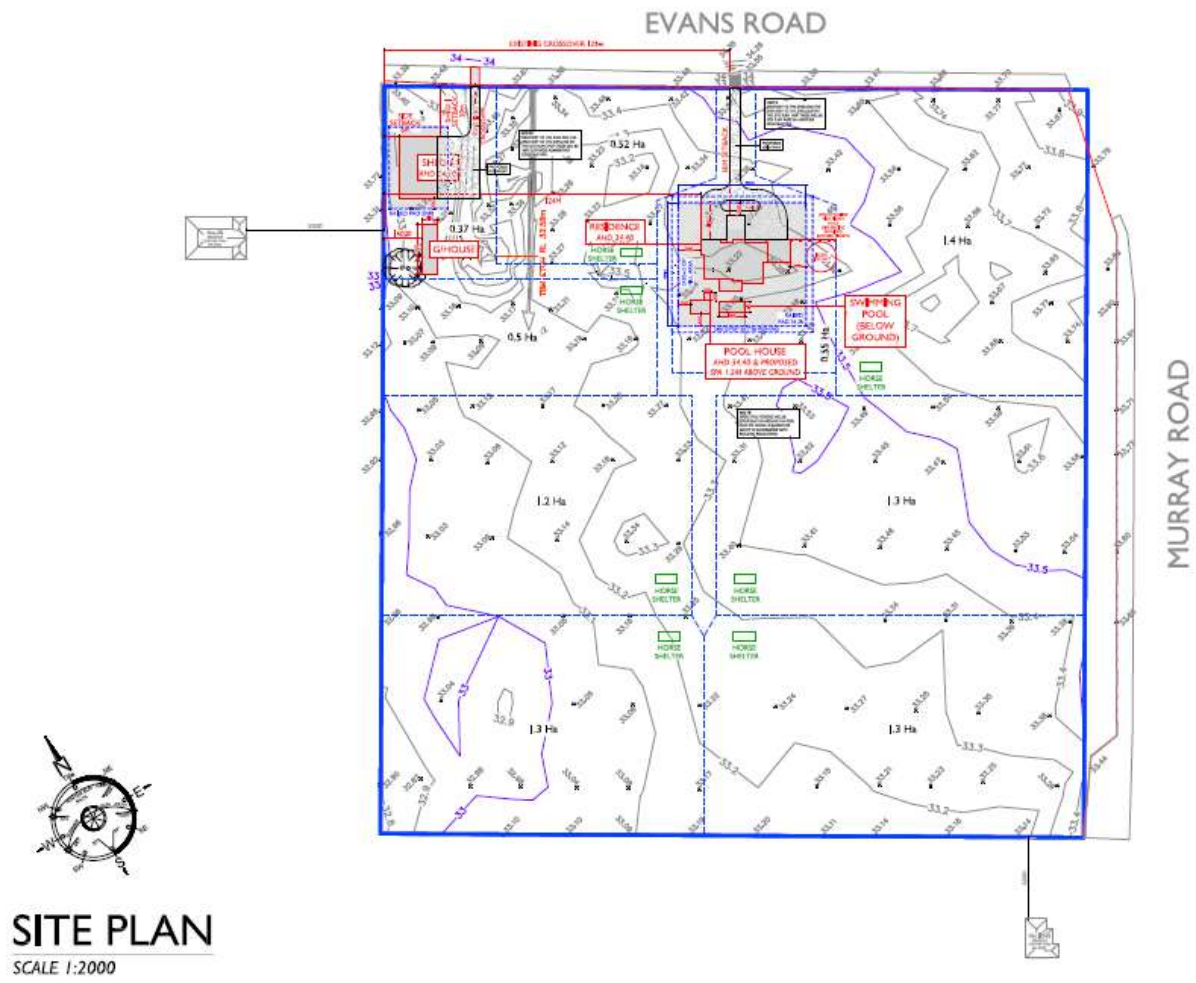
Extract of Site Plan, Jackson and Fapio Pty Ltd
